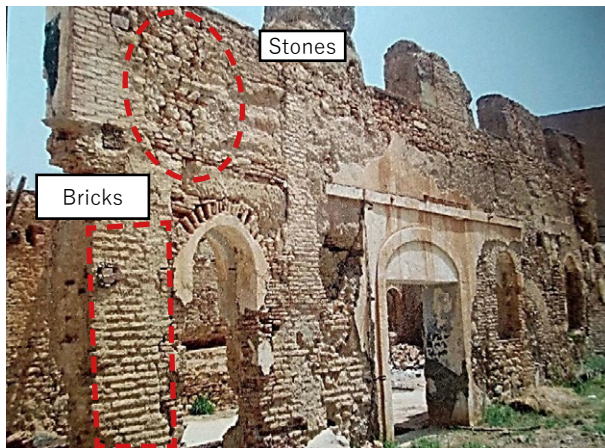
Use of stones and bricks in wall construction. (Source: Technical Design Office A.R.C.A.D.E. 2011).
